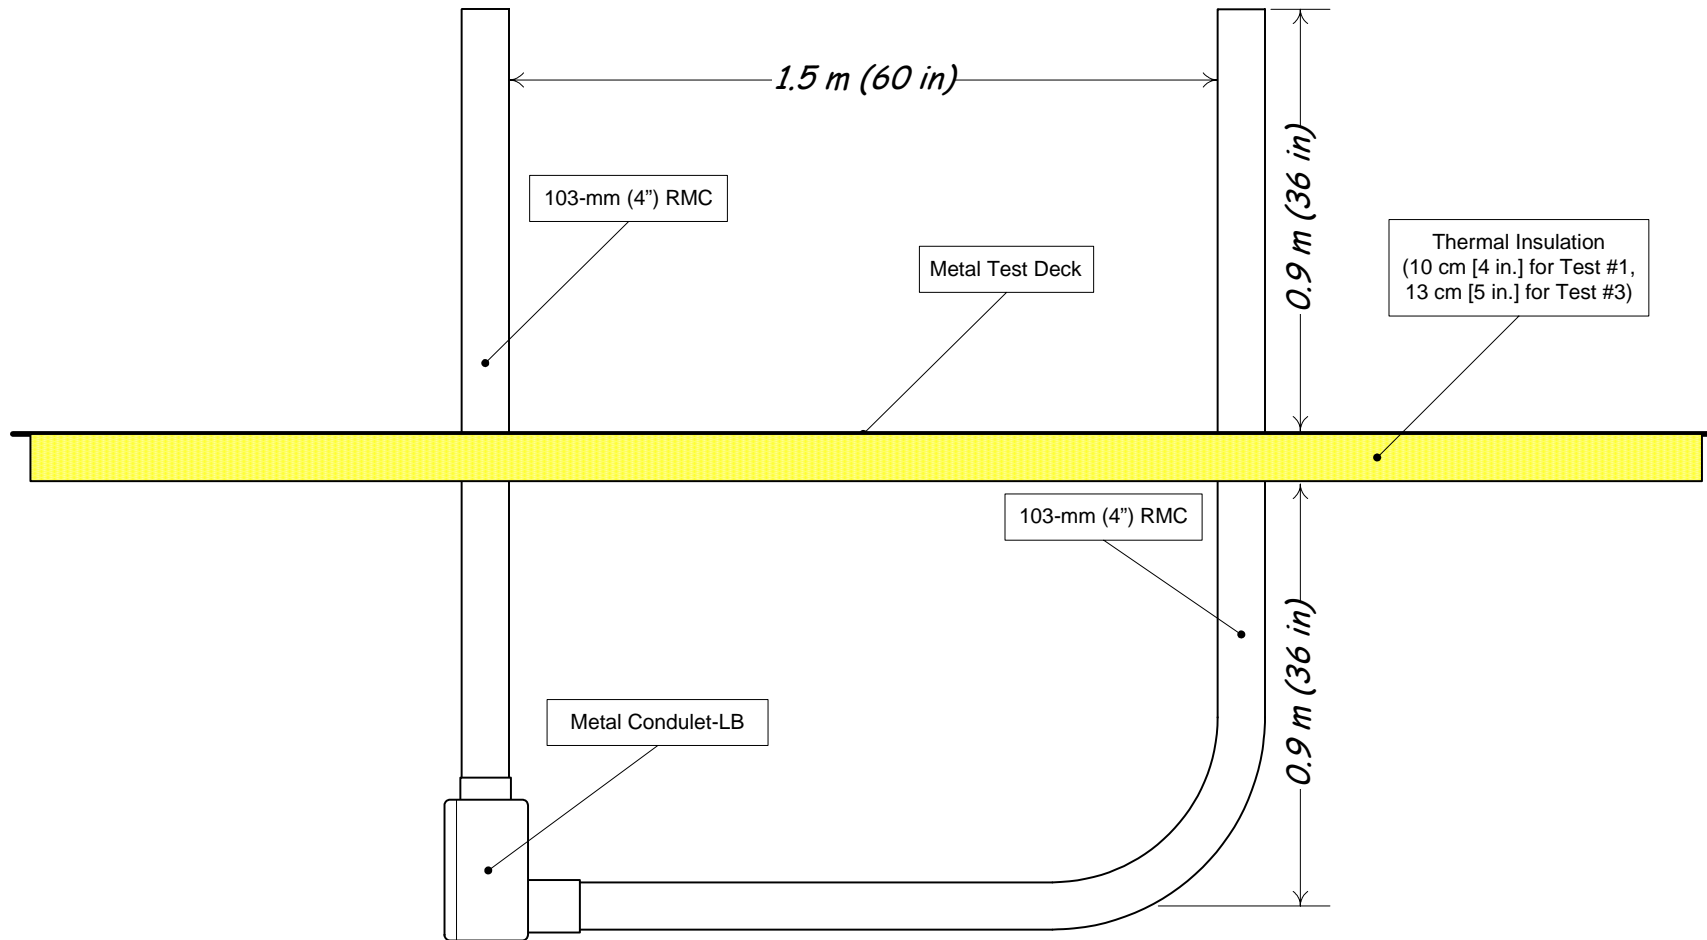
103-mm (4-in) rigid metal conduit test specimens (side view with dimensions).
